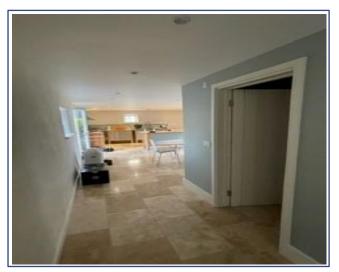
The Byre Utility Room looking towards the Kitching/Dining area.
